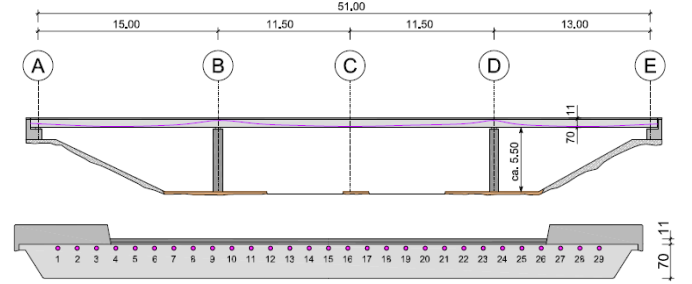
The elevation and the cross-section (axis B/D) of the "Deutsche Bank" bridge
